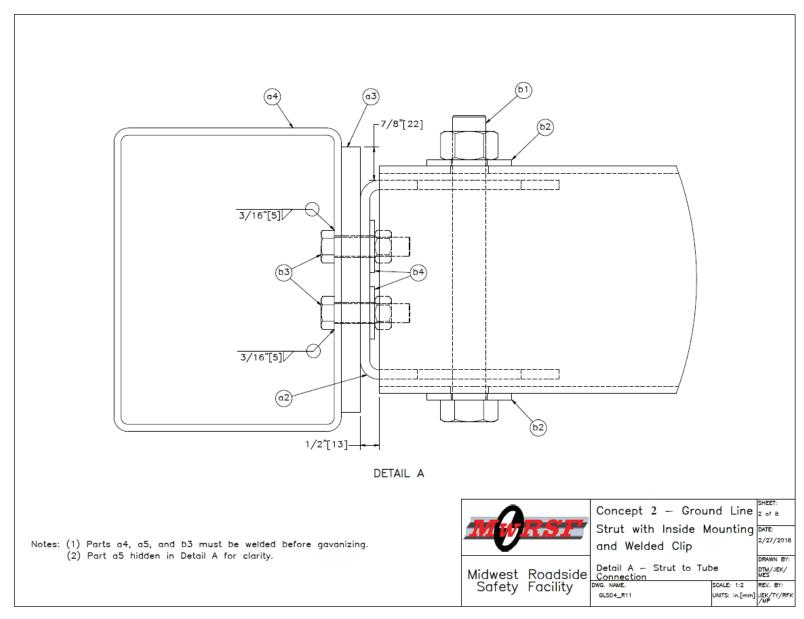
Ground Line Strut Design Concept No. 2 – Strut to Tube Connection
